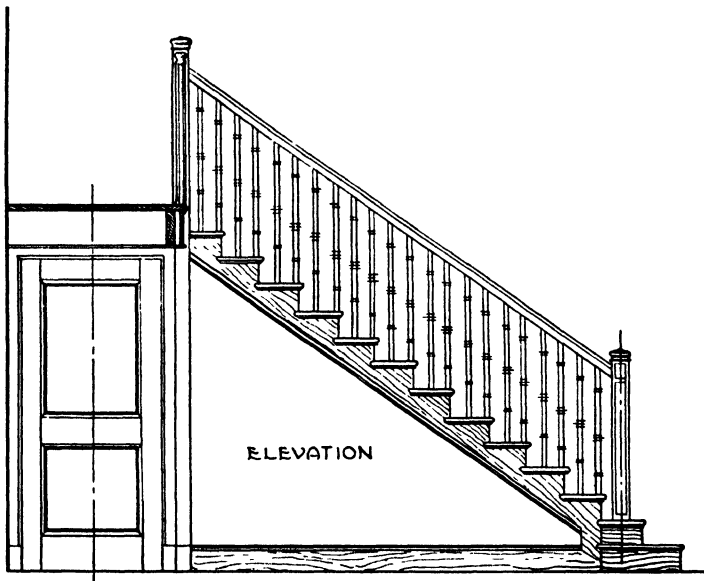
Elevation of Stair Shown in Plan in Fig. 54
